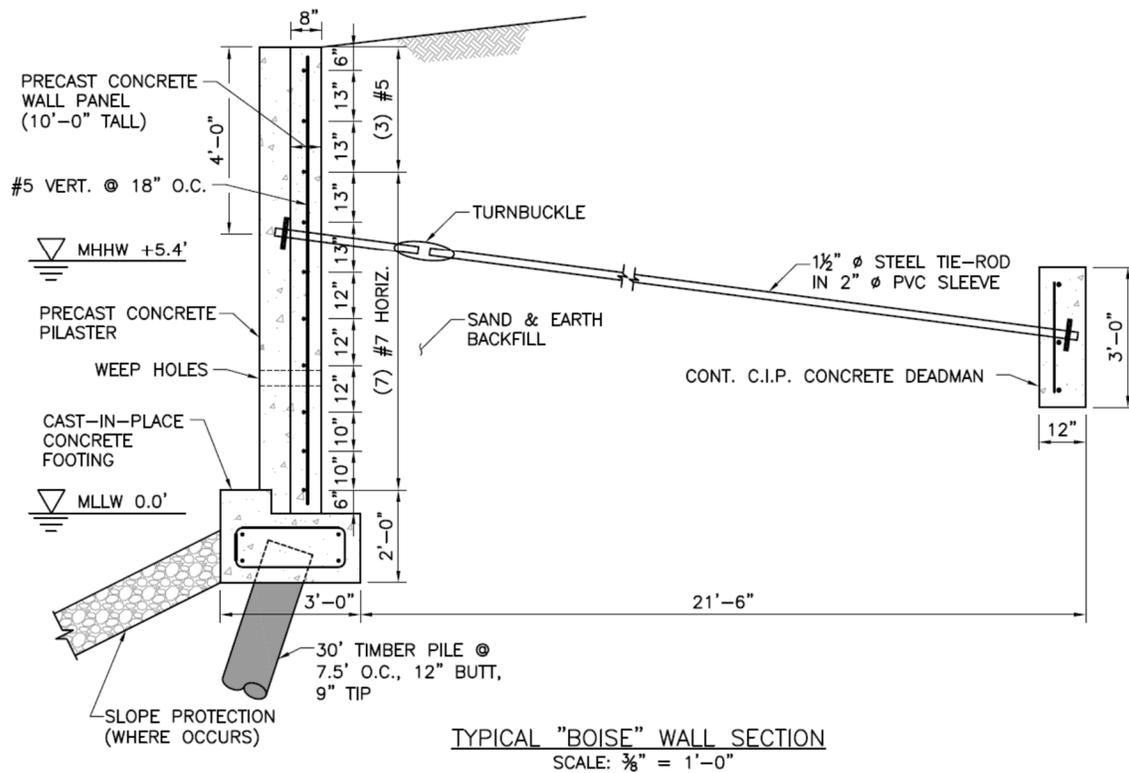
Typical Boise wall [from TranSystems (2017)]
